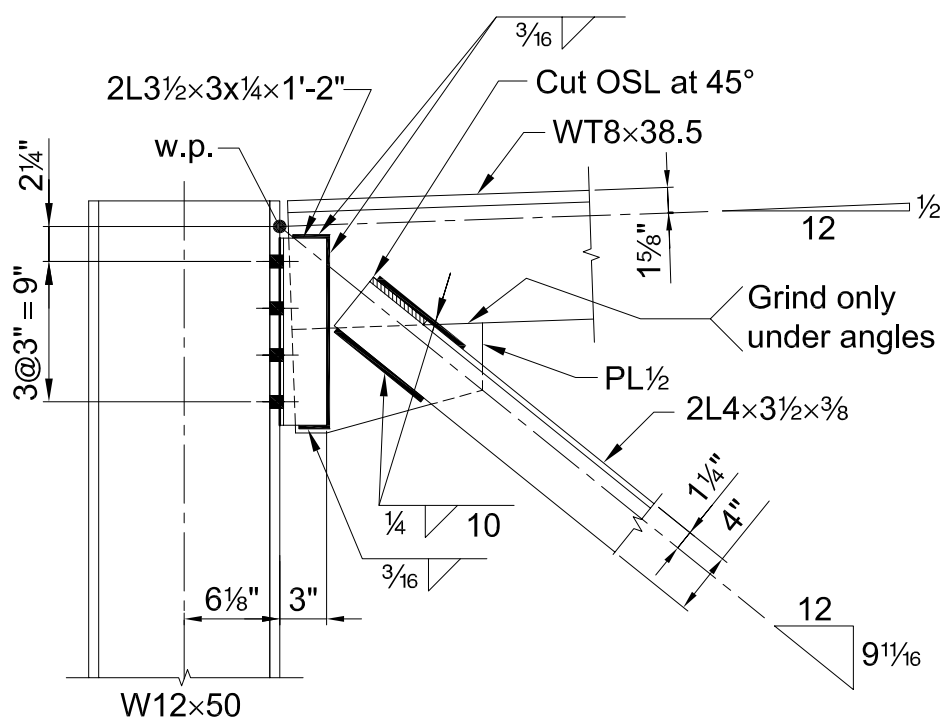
Truss support connection, working point (w.p.) on column face.
